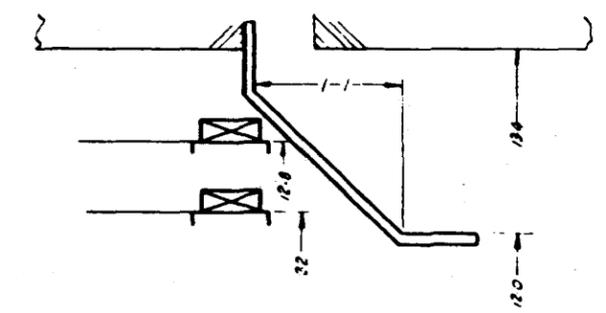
TYPICAL SINGLE LINE CABLING AND CABLE RACK PLAN DRAWING
